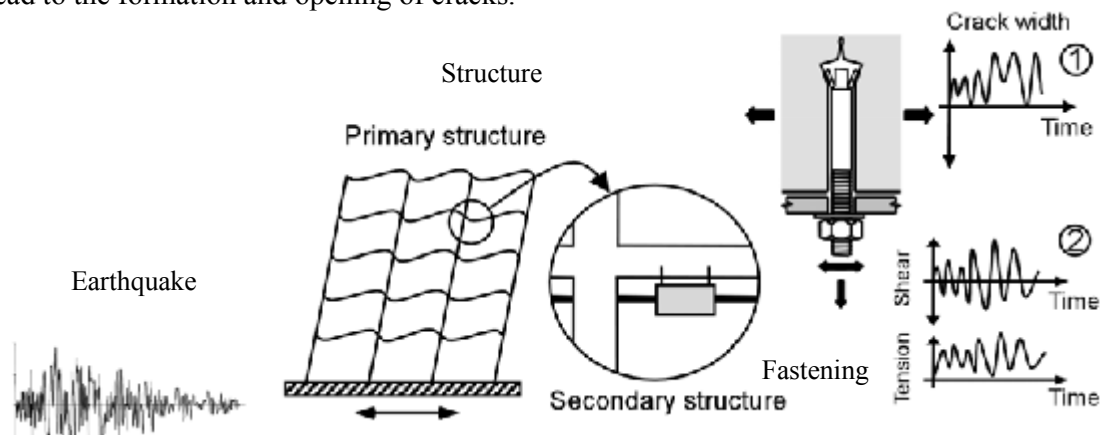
Actions acting on nonstructural anchorage under earthquake loading.⁹
